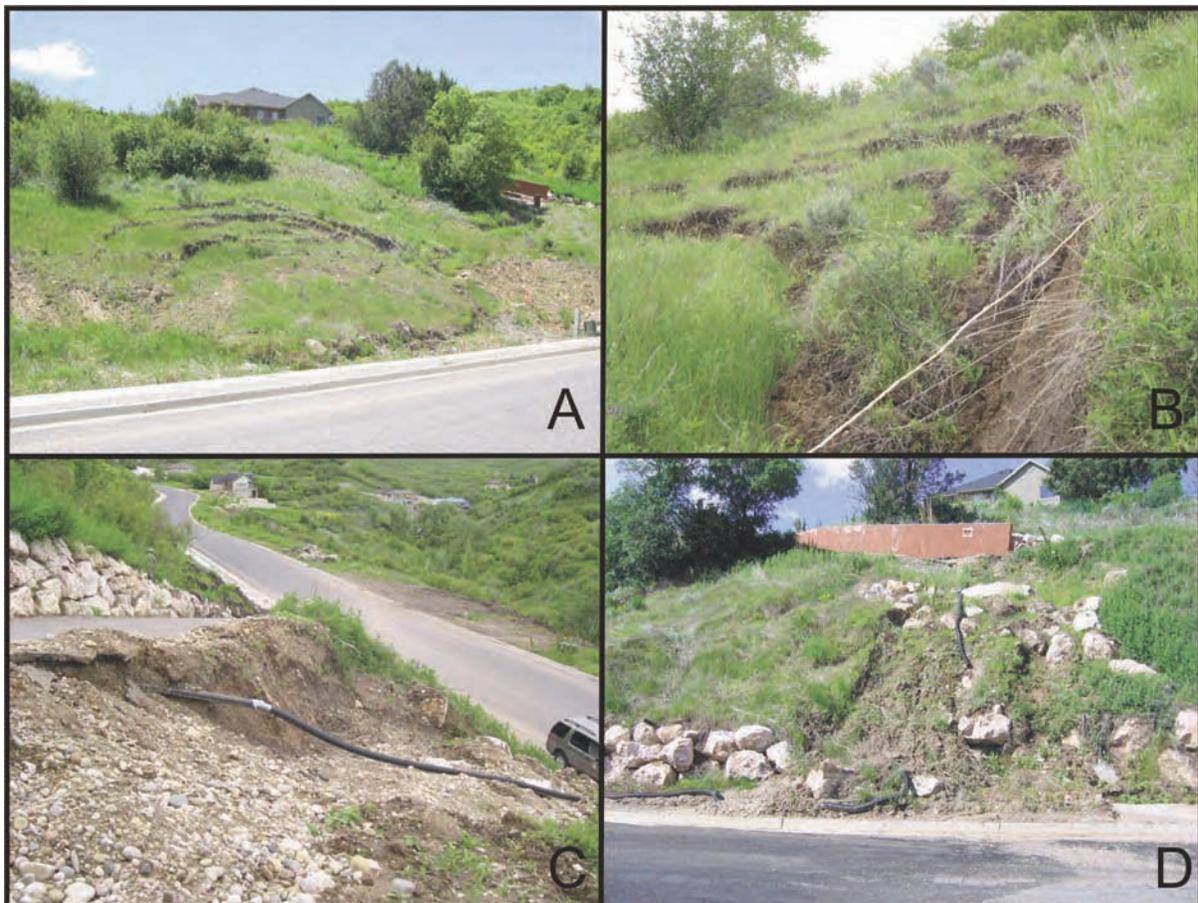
Small shallow slides on or straddling the Creekside Drive landslide. (A) View to the southwest of small shallow landslide in cut slope near boundary between lots 21 and 22. (B) View to the southeast of main scarp zone showing stretched white electric line. (C) View to the west of main scarp and west flank of small landslide between driveway at 6023 N. and Creekside Drive. Main-scarp offset severed drainpipe in 2005 (repaired in photograph). (D) View to the southwest of slide in photograph C in June 2006. Note new damage to drainpipe and displaced material burying sidewalk. Small rock wall on left was continuous across slide in 2005.
